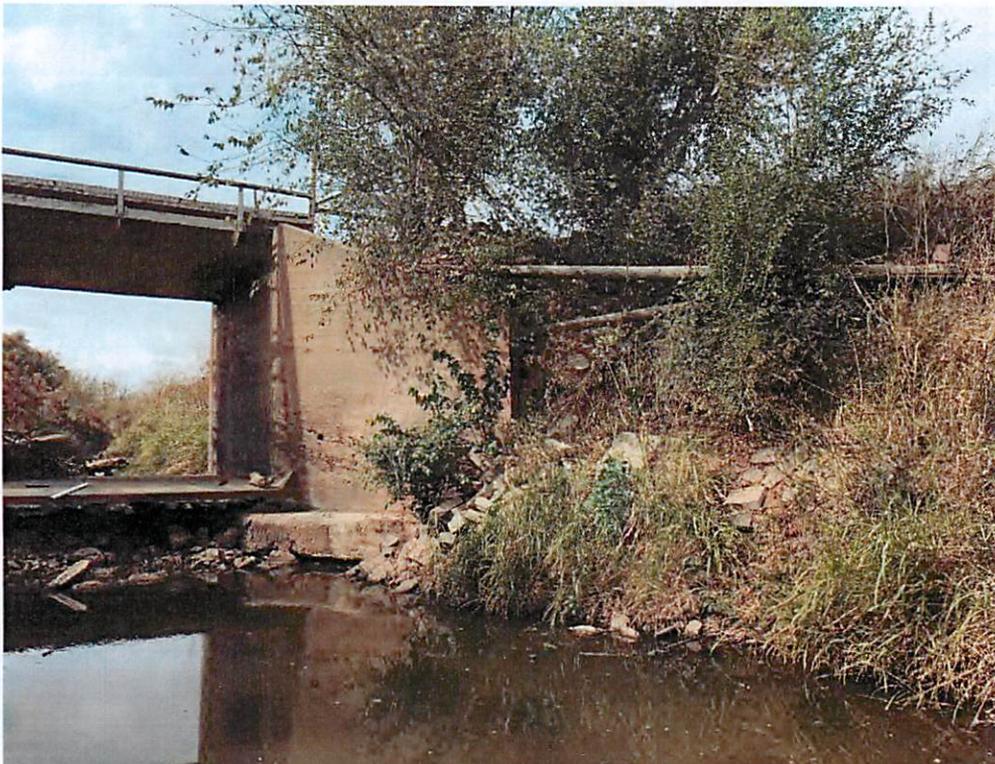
undermining and erosion at the downstream wingwall of the north abutment.
